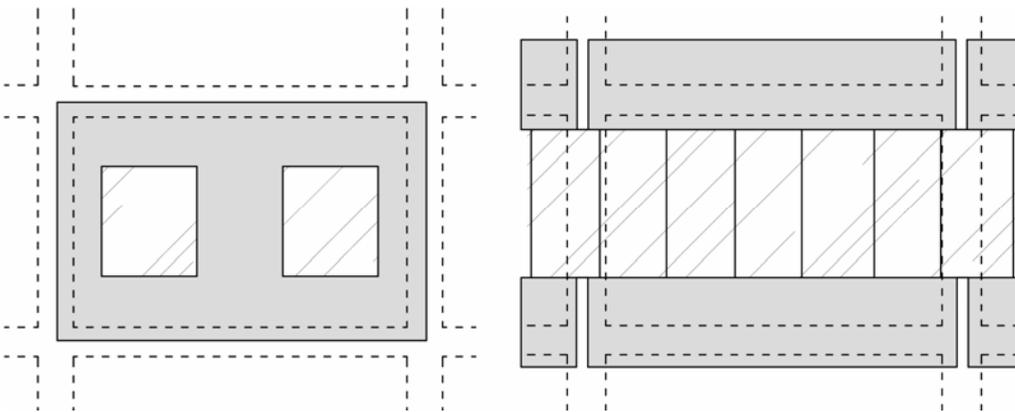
Two typical arrangements of panels on a framed building structure.
